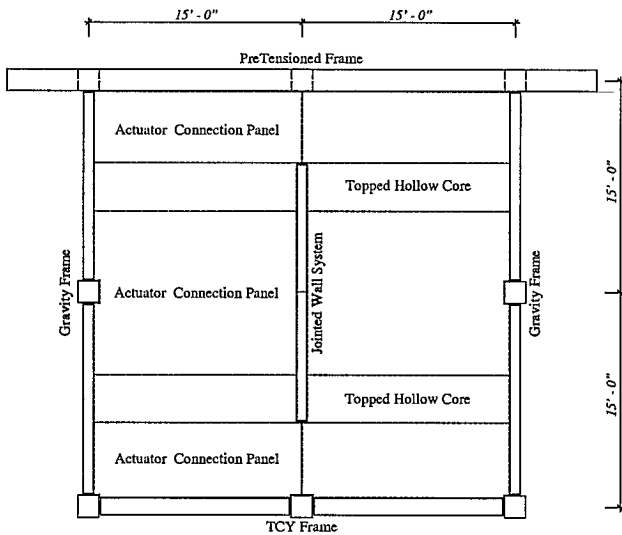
Floor plan of the test building at Levels 4 and 5.
